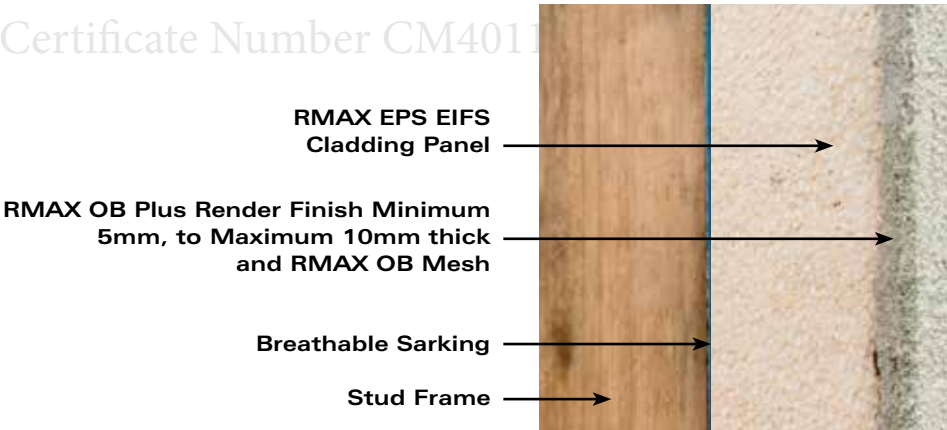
Cross section of complete RMAX Direct Fix EIFS Cladding wall system.
